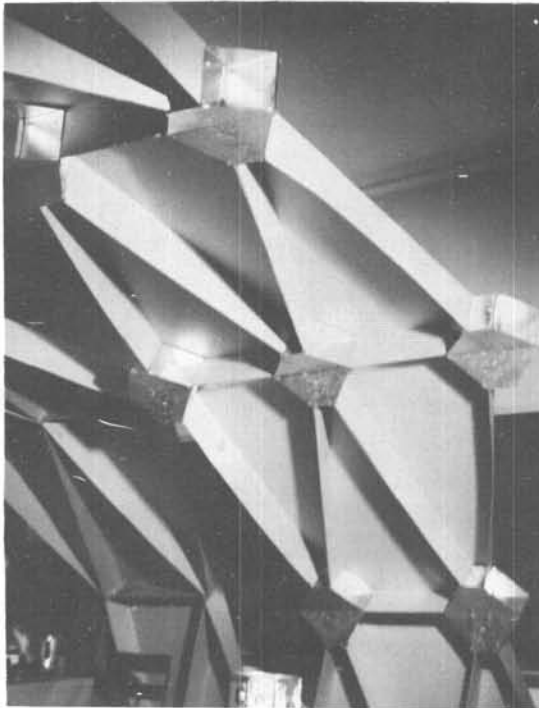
Detail - "Asterisk" connector being installed on full-size test arch.
